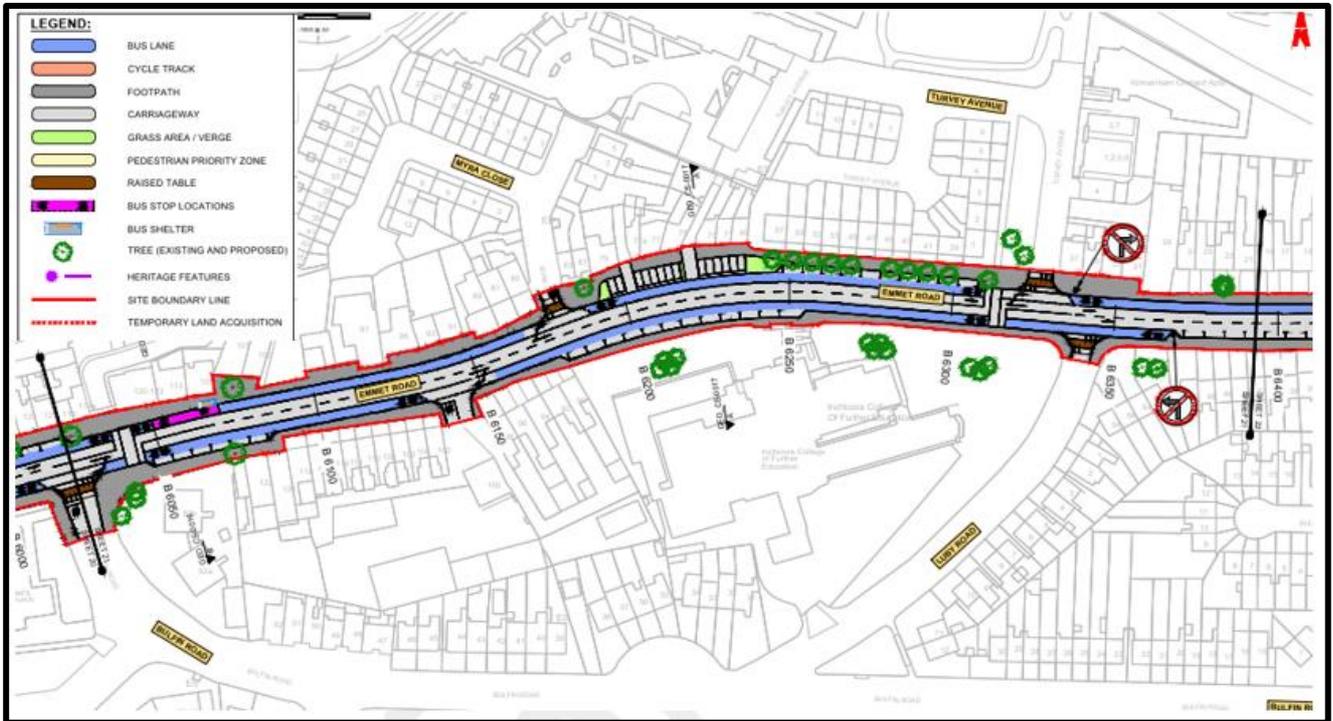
Proposed works at Emmet Road, Ch B06+350 – Ch B06+400
